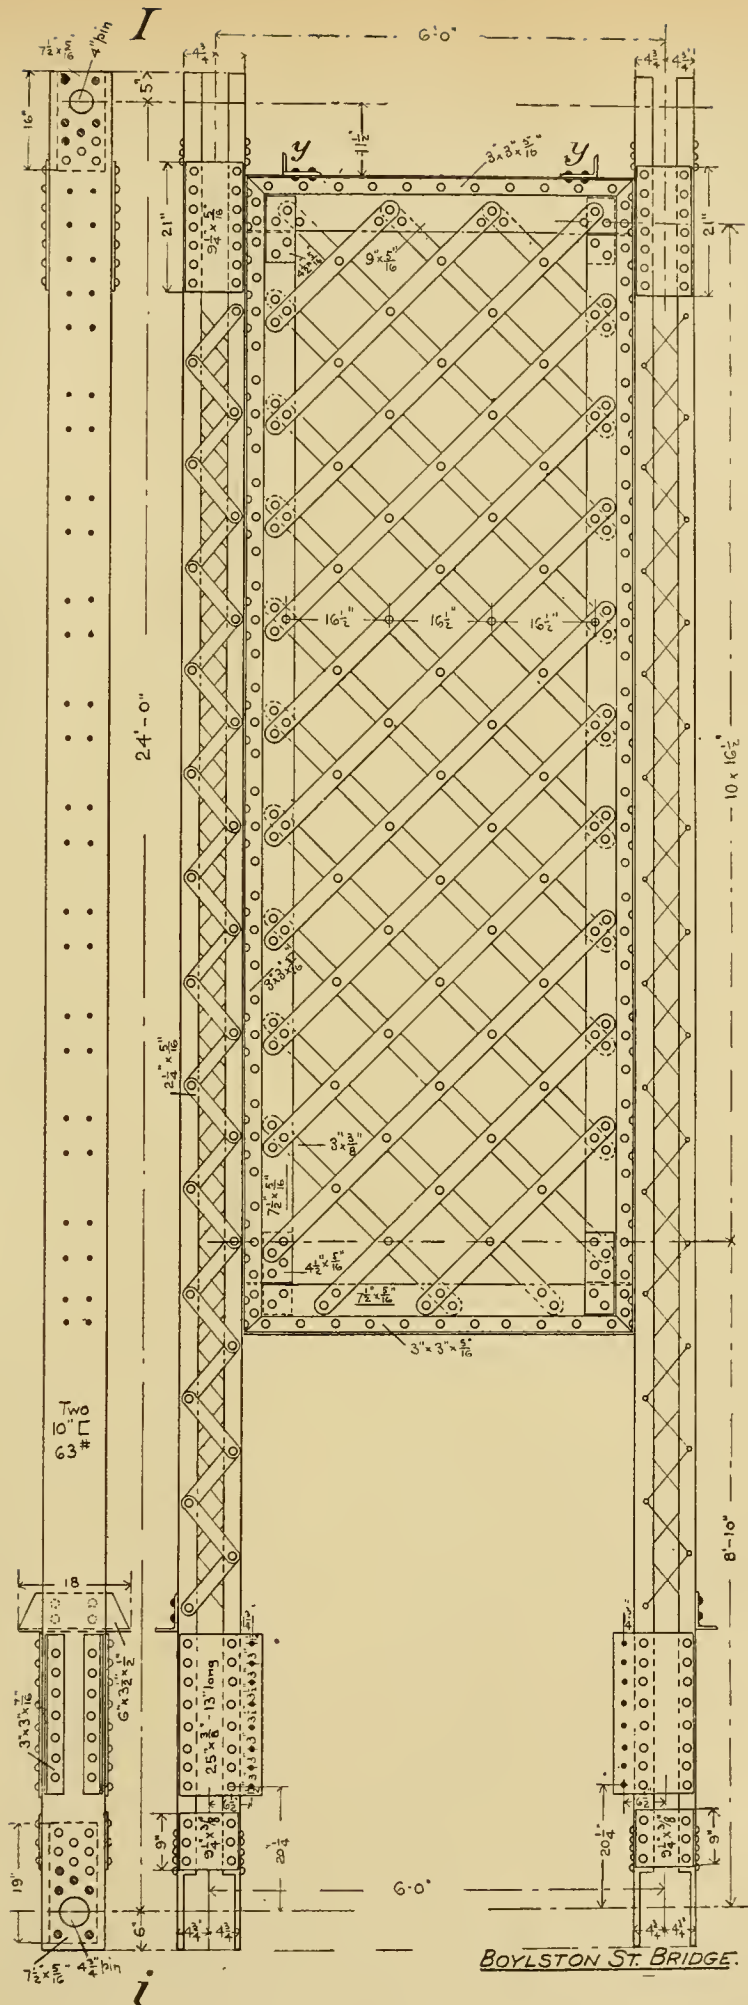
VERTICAL TRANSVERSE BRACING BETWEEN ORIGINAL TRUSSES.
